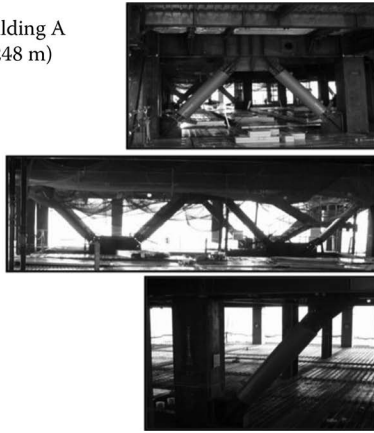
The BRB structural system in the Midtown building in Tokyo.
